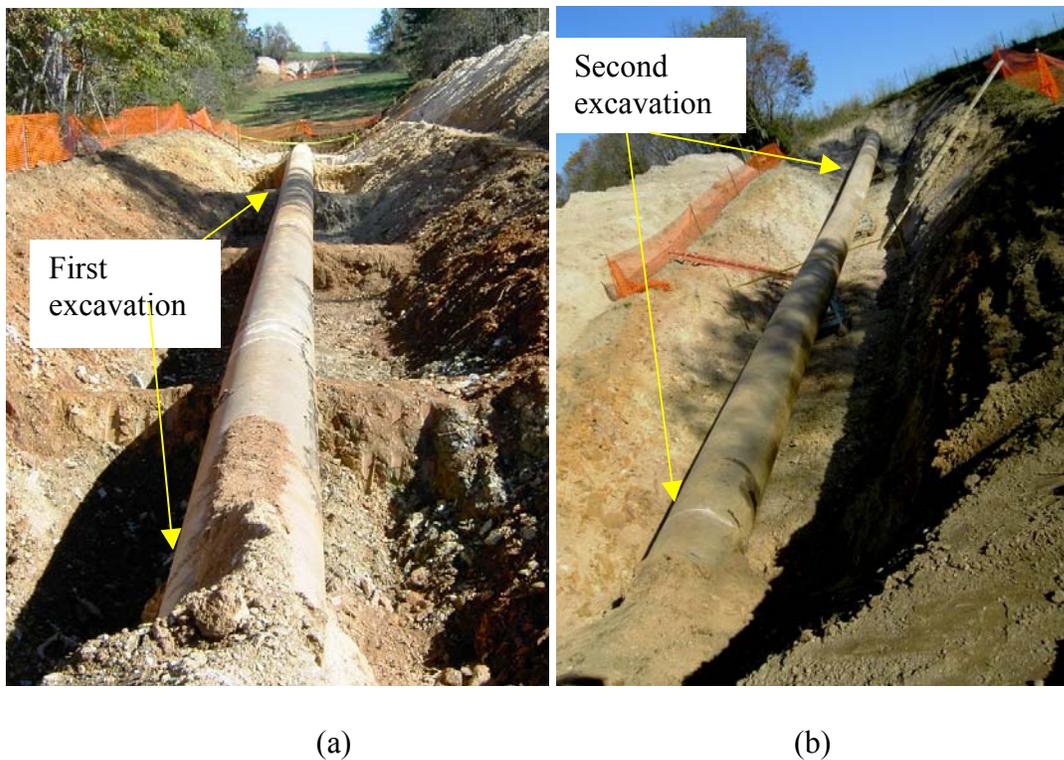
Site #2 (a) first excavation and (b) second excavation.
